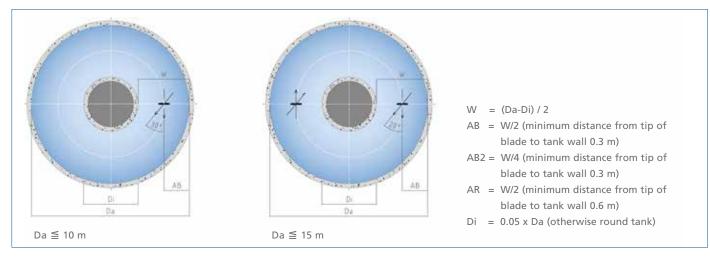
Annular tanks | Stormwater overflow tanks (floor drainage via drain channel around the circumference of the central structure)
